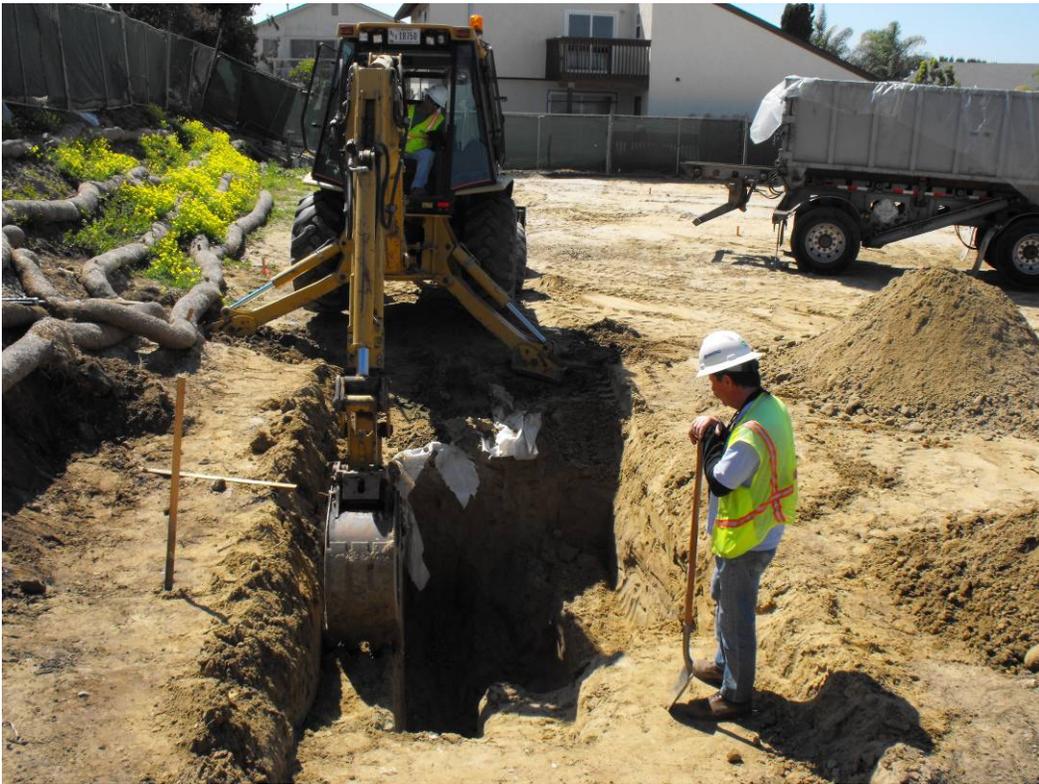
March 16, 2009 – Excavation of Soil Impacted by JP-5, Showing Benching on West Side of Excavation
